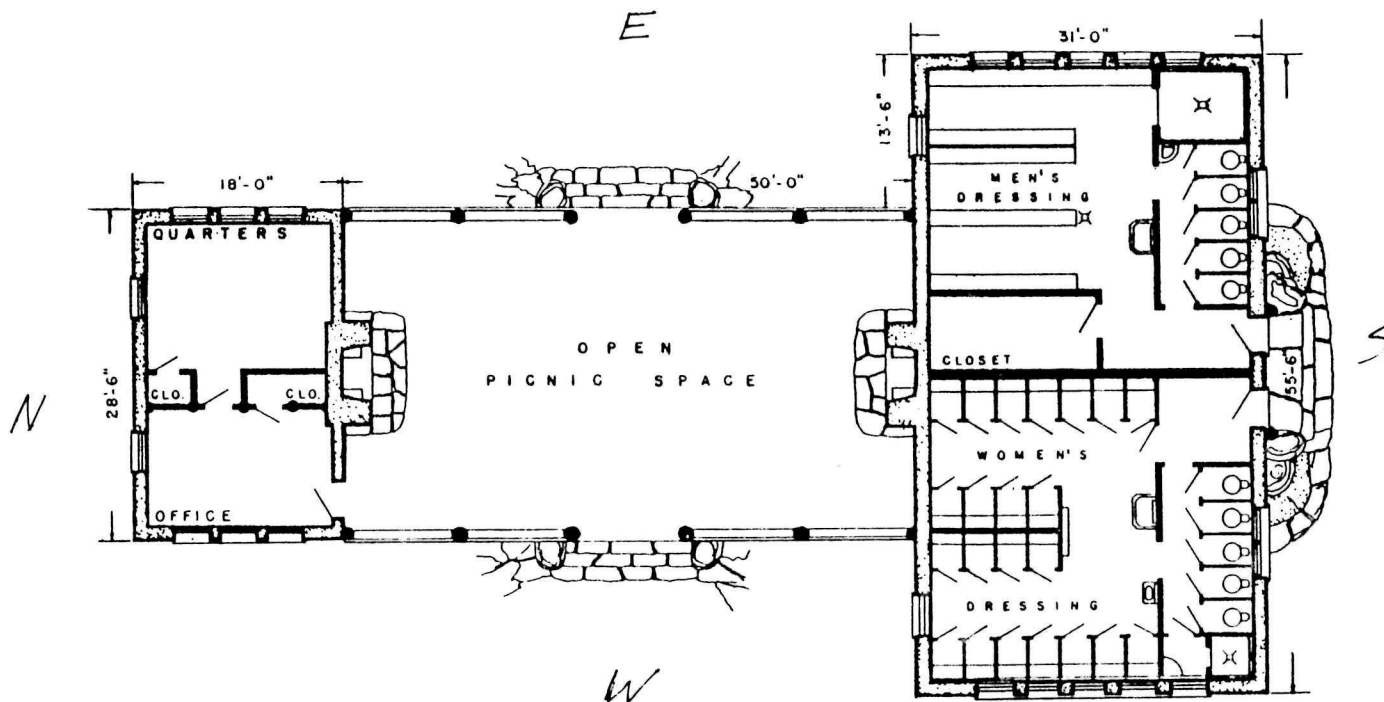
Forest camp bathhouse plan, Region 7. (From Forest Service, Division of Engineering, *Acceptable Building Plans*)
